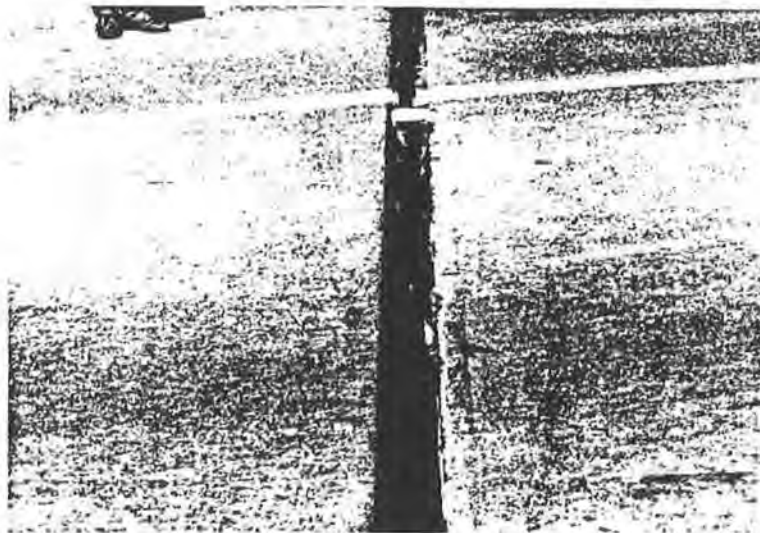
Sealed Armor Joint with Advanced Deterioration of Seal Due to the Excessive Opening of Joint [16].
